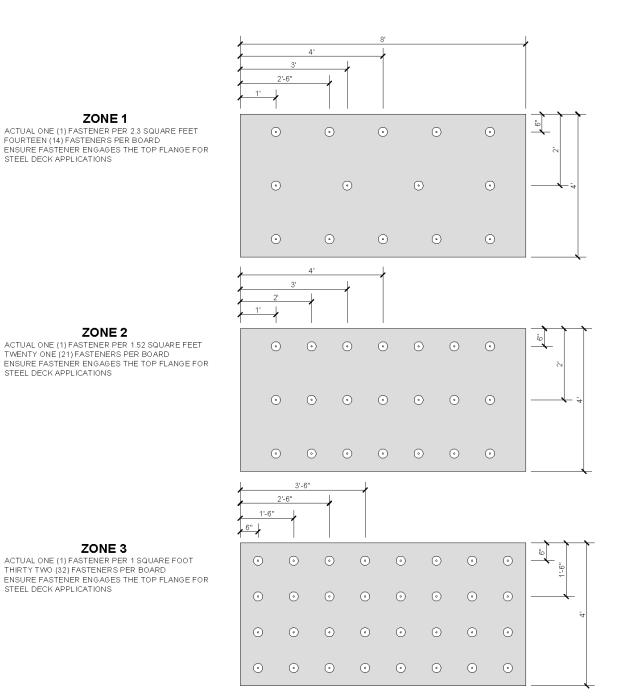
Four Feet by Eight Feet Board, Mechanically Fastened, 1 Fastener Per 2.3 Square Feet Fastening
